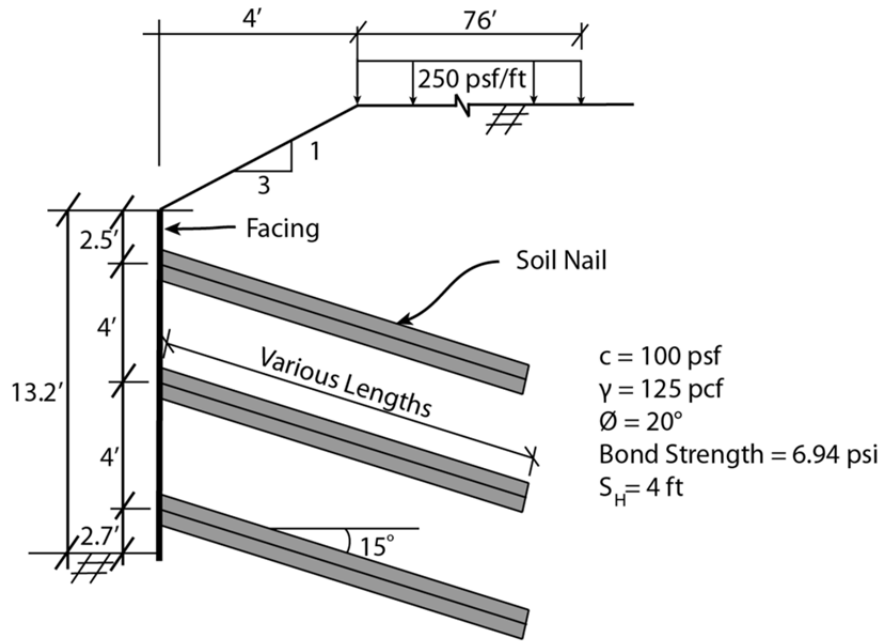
Soil nail wall layout 1 for comparison in SNAILZ.
